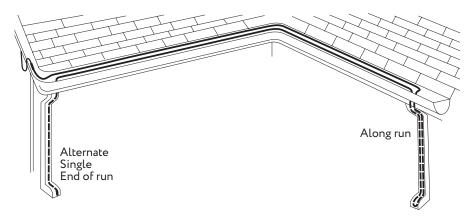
Cable installation through the gutter or drainage pipe in two threads
